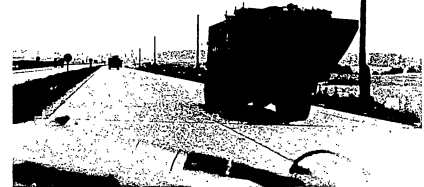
End Section TTP Ponton W/Typical Load Of Accessory Equipment. (U)
